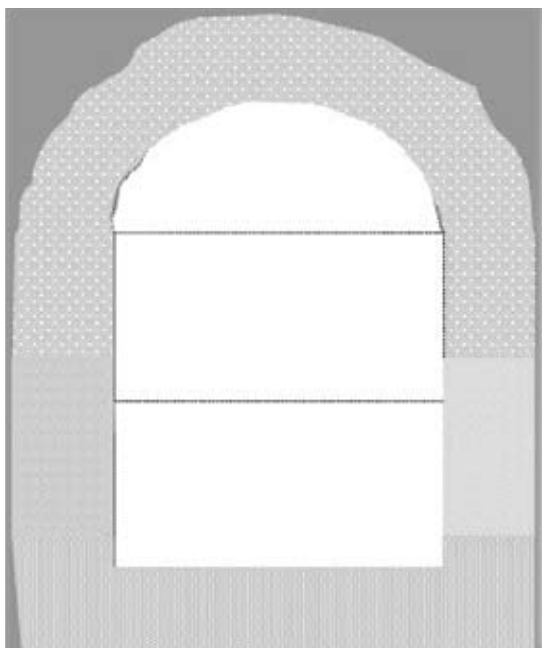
Excavation and grouting of the propane storage cavern at Mongstad.
